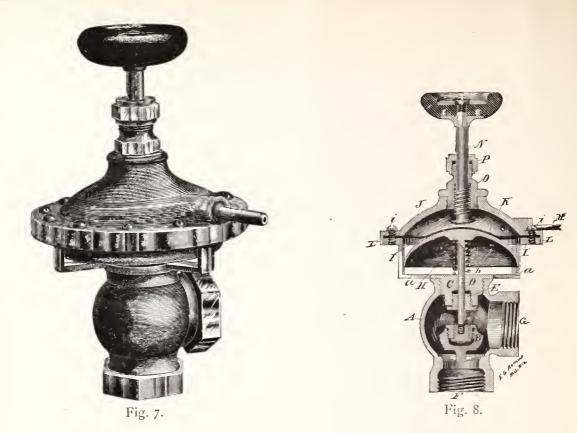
shows the outside of one of these valves, which is adapted to be put upon a steam radiator. Fig. 8 is a sectional view of this same valve, showing how it operates.
